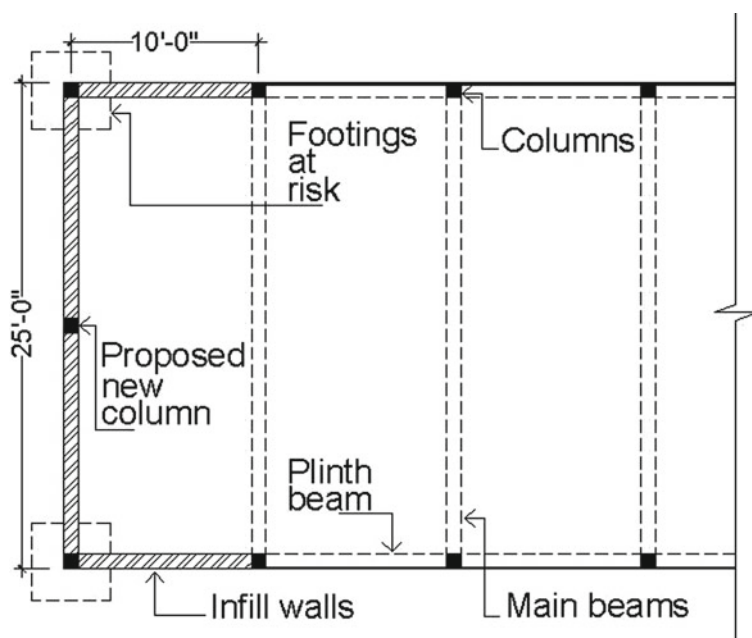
Proposed new column and infill walls in type plan of school building to prevent failure in conditions where scouring is expected (after Dias et al. 2006)
